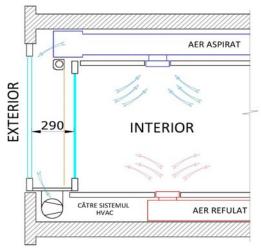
Air flow through DVV building's façade, Brussels, Belgium. Drawing not at scale.
